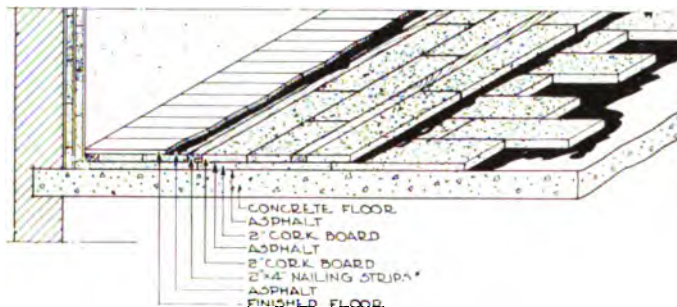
DETAIL OF FLOOR—FOUR INCHES OF CORK BOARD WITH WOOD WEARING FLOOR.
